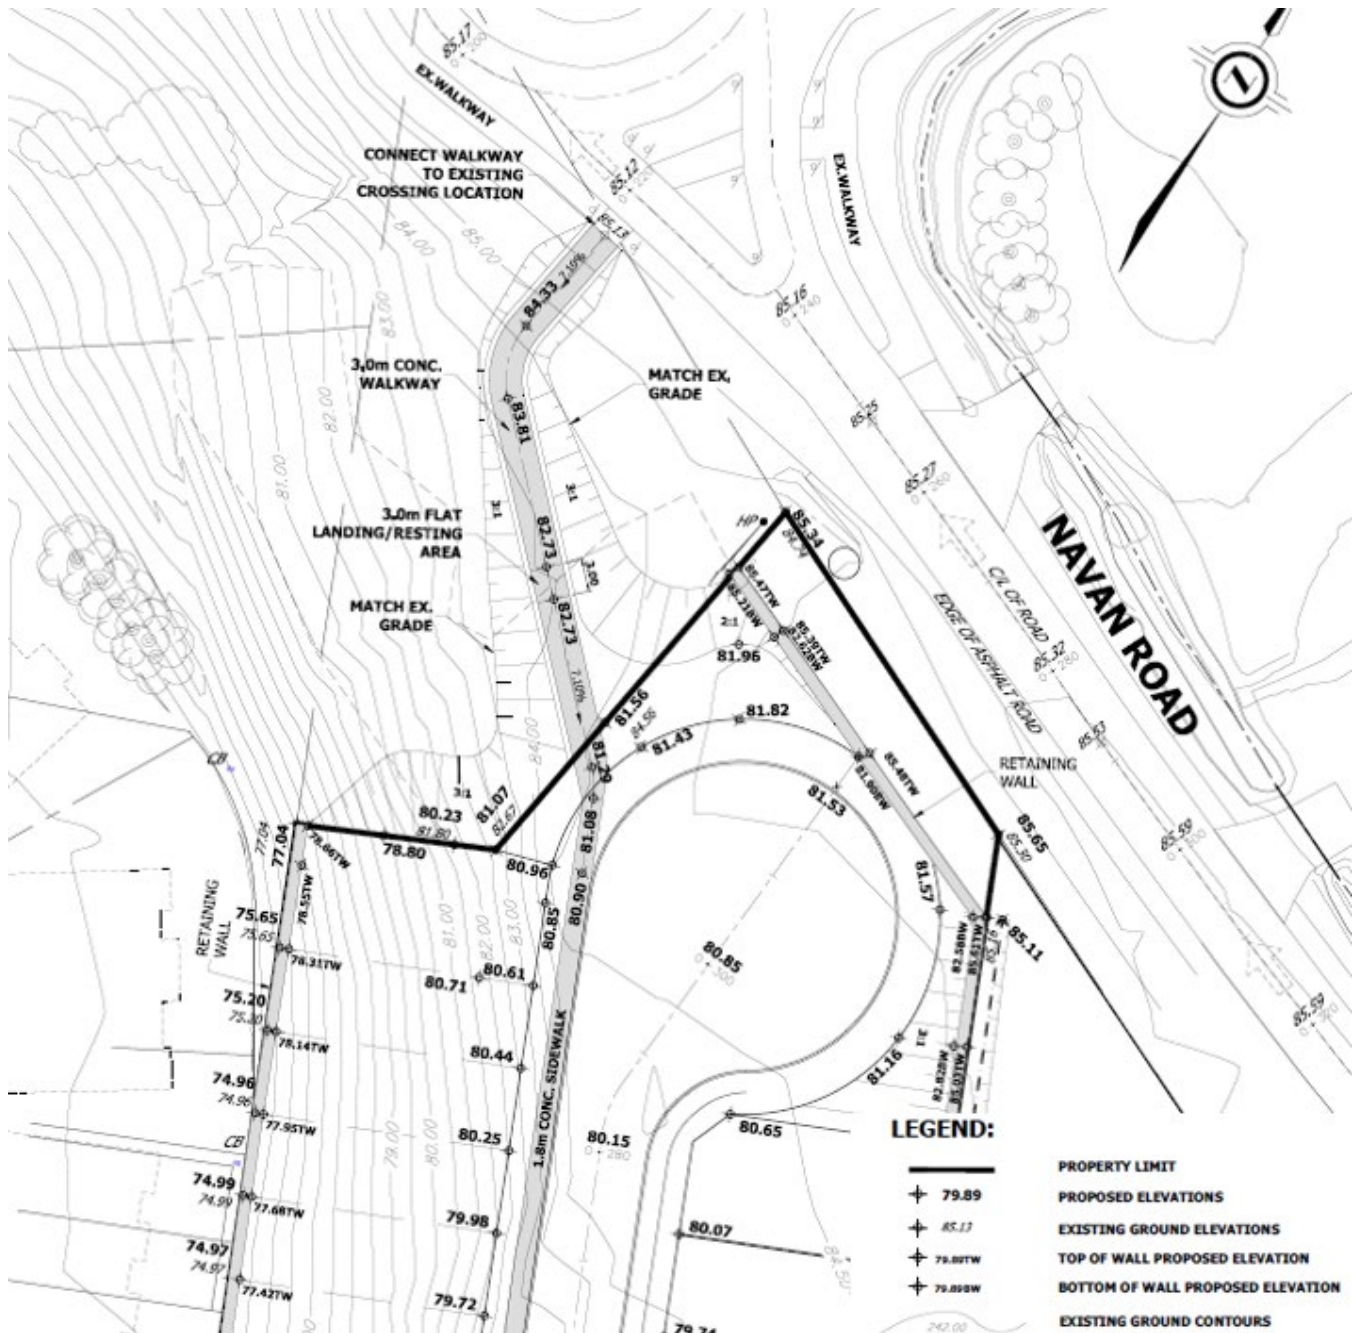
Excerpt from a Preliminary Walkway Plan Connecting the Subject Lands to the Existing Walkway at the Intersection of Brian Coburn Boulevard and Navan Road to the North
